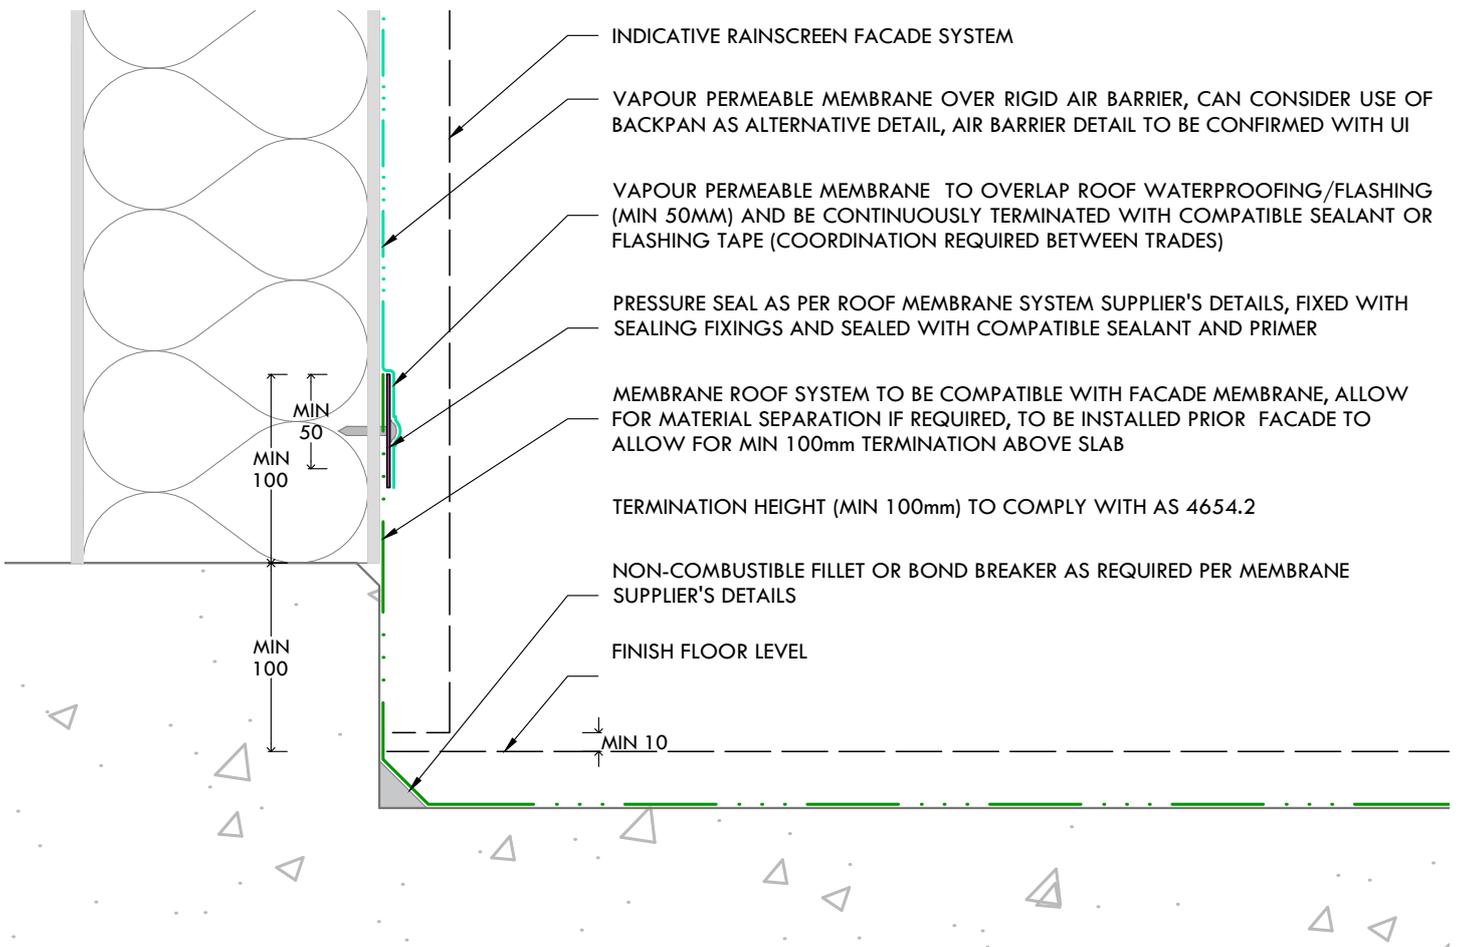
MEMBRANE ROOF TERMINATION AT RAINSCREEN FACADE
